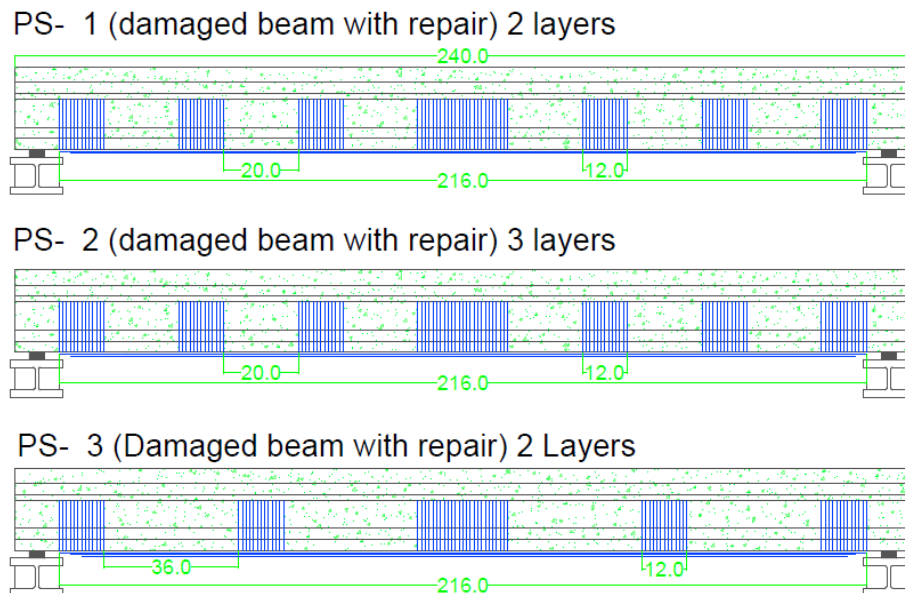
CFRP repair configuration layout for half-scaled PSC girders tested in fatigue
